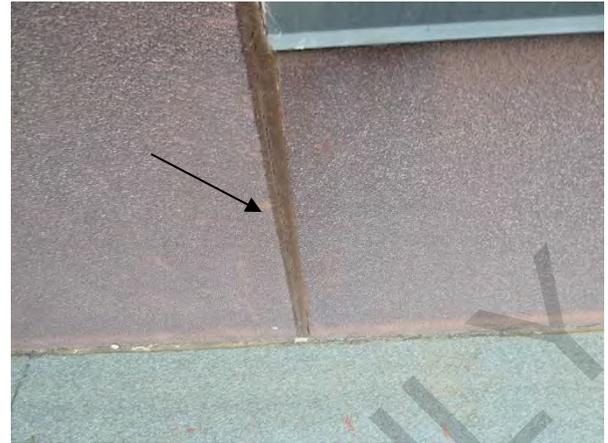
Cement sheet cladding has been sealed at the base of terraces and balconies.
